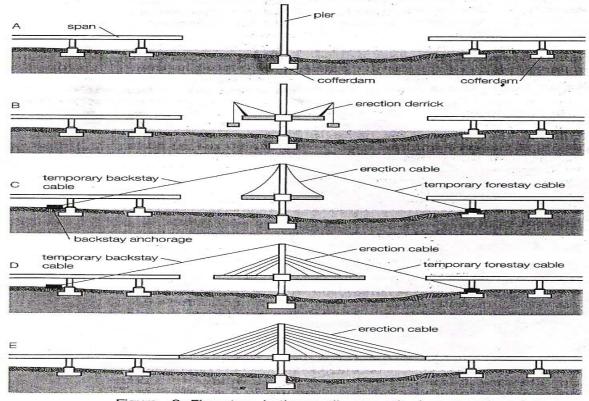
Five steps in the cantilever-method construction of a cable-stayed bridge.
